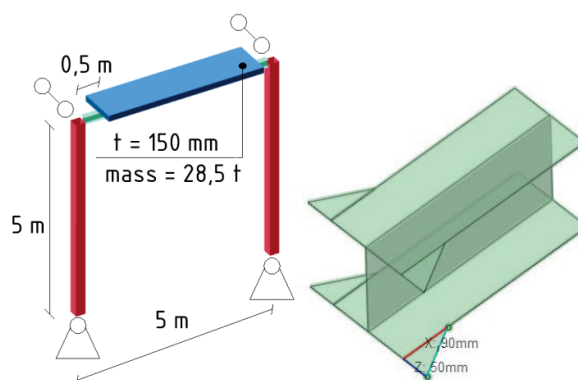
Scheme of pseudo-flat single-story frame and shell moment connection sections
